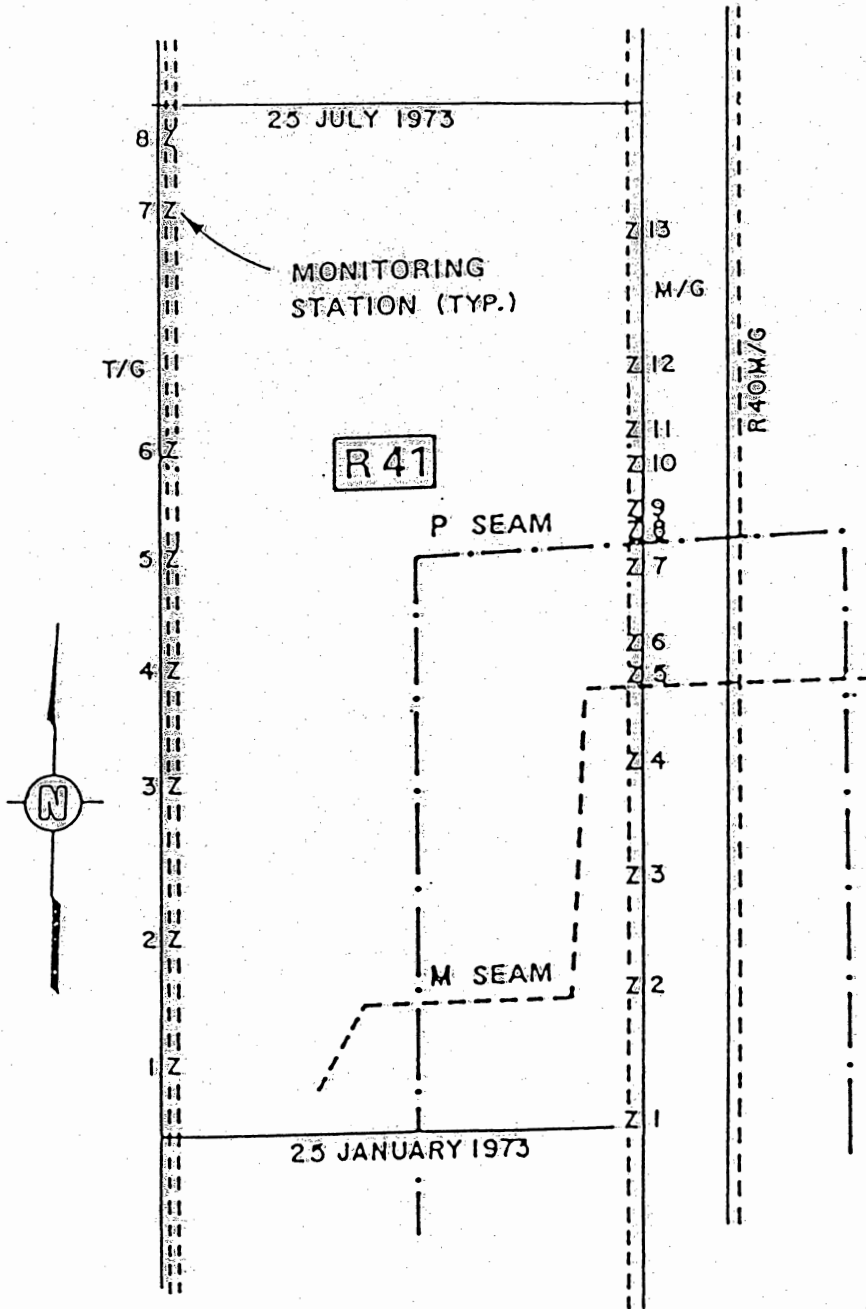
Plan of the Workings at Colliery A (Dunham and Stace, 1978)
